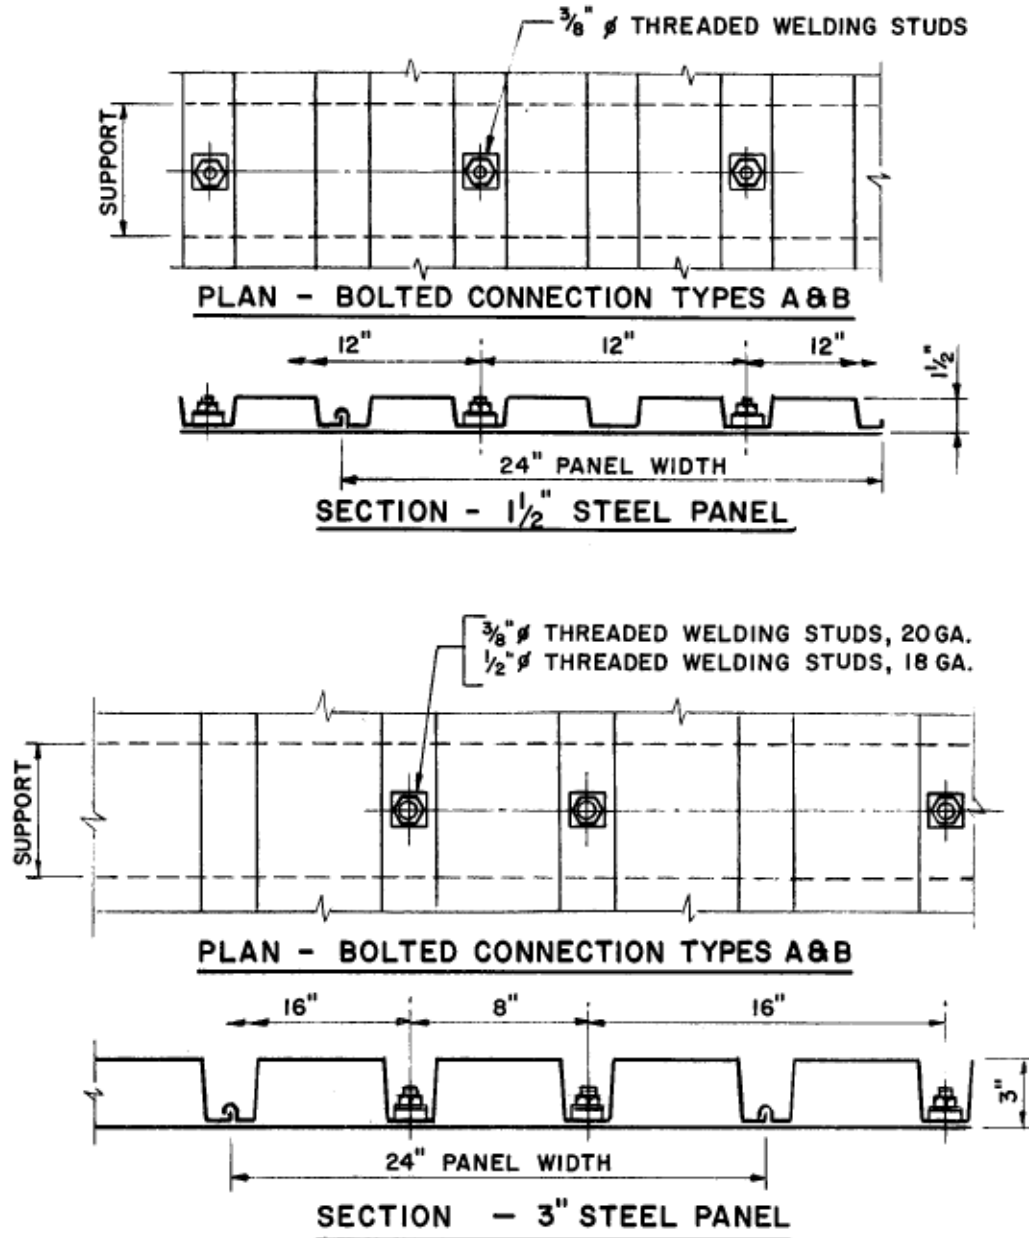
Details of Typical Fasteners for Cold-Formed Steel Panels
